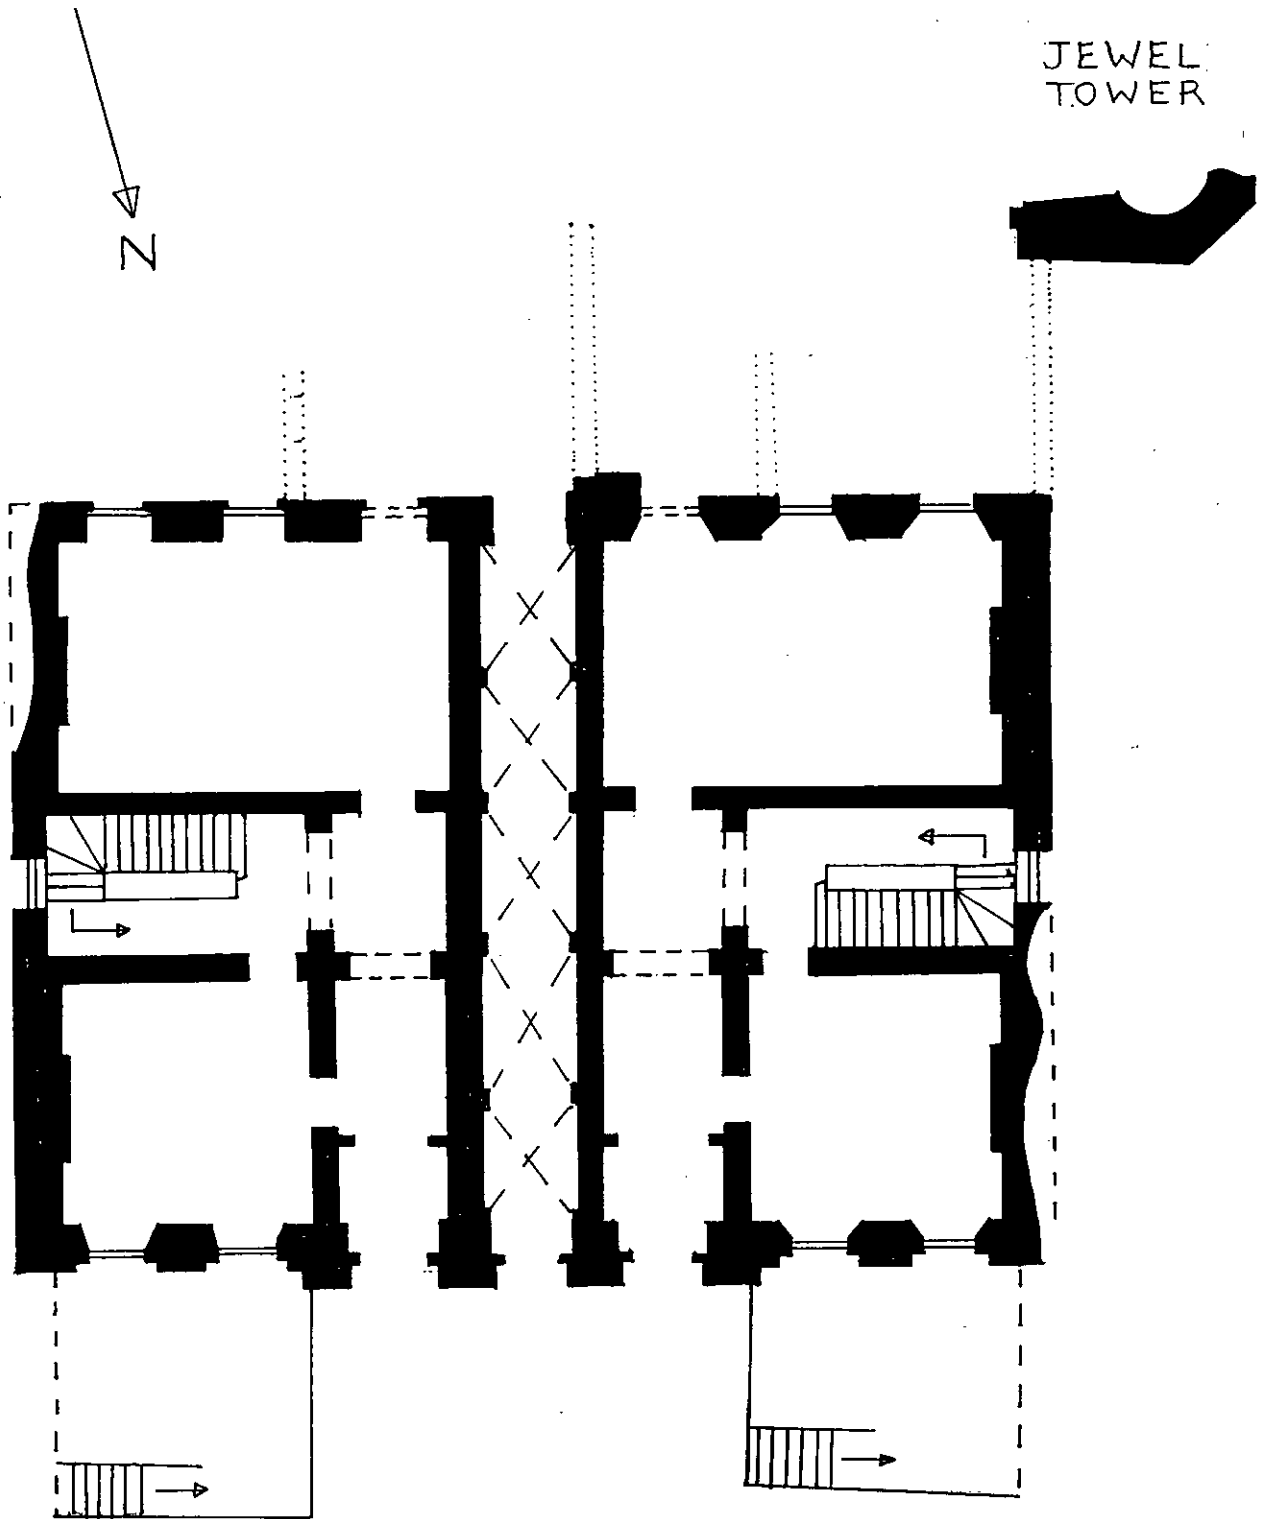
Conjectural reconstruction of the ground floor plan in 1756. Not to scale.
